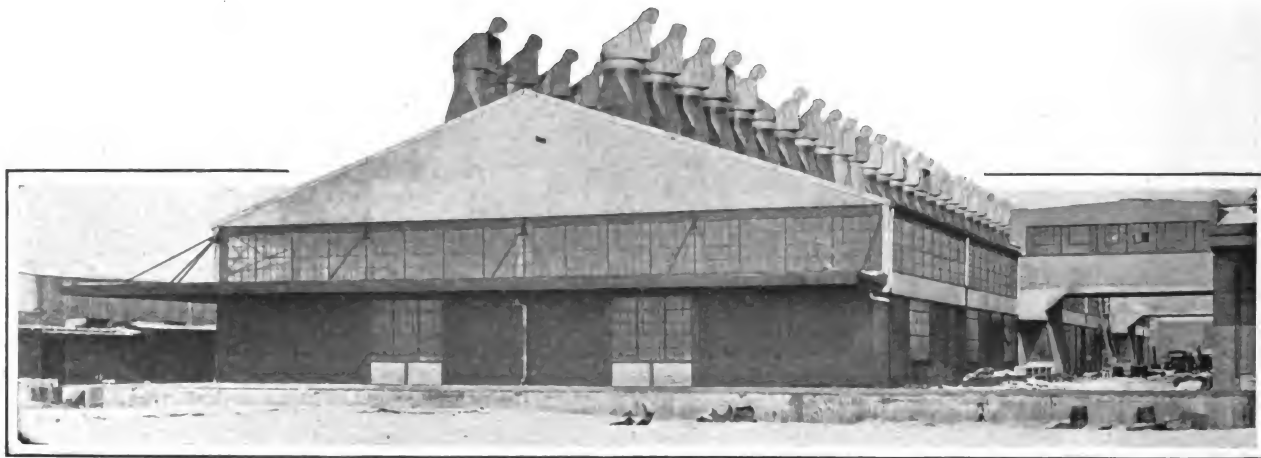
This shows the design of heat treating building and the location of overhead toilet rooms in the court between this building and the main building
